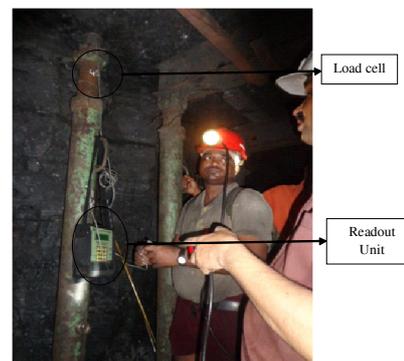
Reading of Load cell installed on hydraulic prop in a typical Underground coal mine (Jayanthu, 2014)
